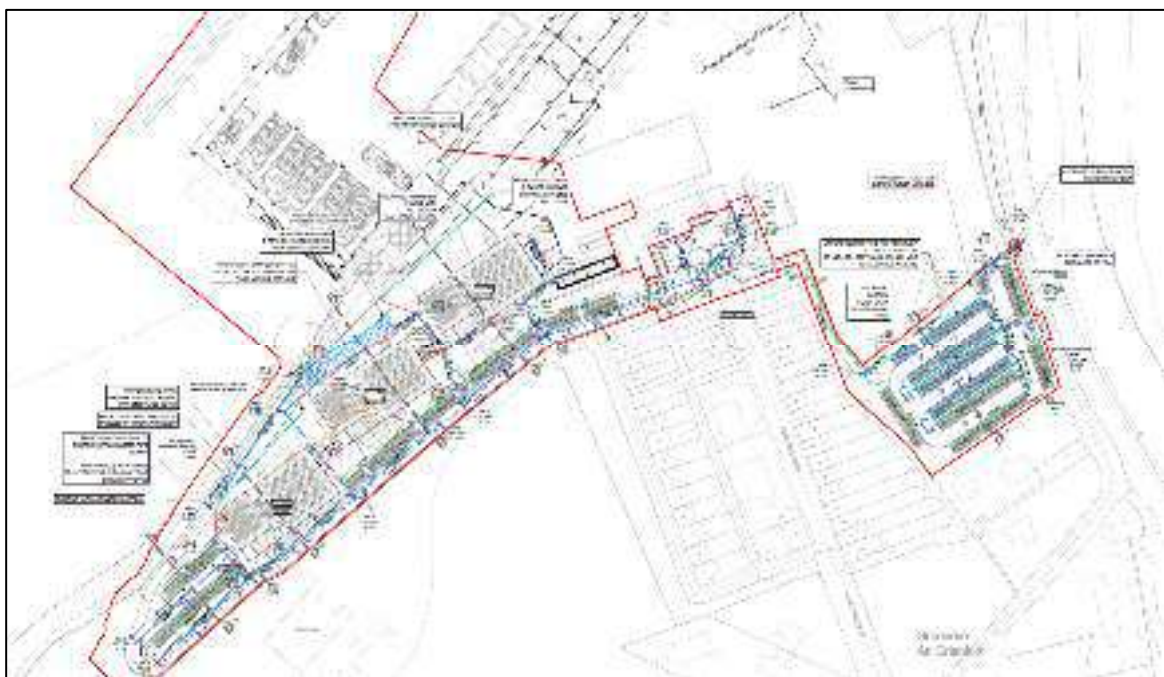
Proposed Surface Water Drainage (Source: CSEA, 2023)
